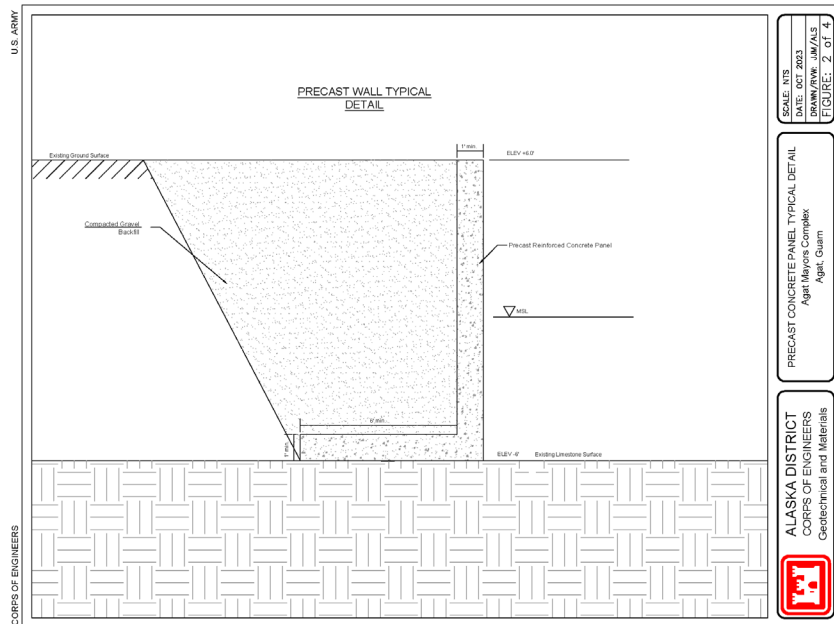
Preliminary Precast Concrete Wall Design Schematic
